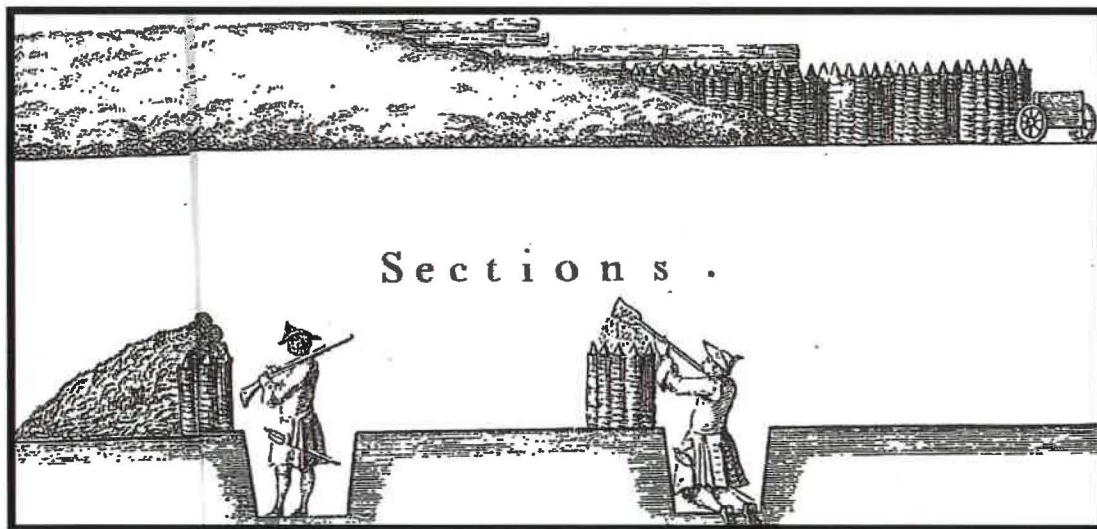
A contemporary view of breastworks with fascines, covered with earth and soil on the exterior and an interior ditch for cover (Muller 2004 (1757) Plate IX).
